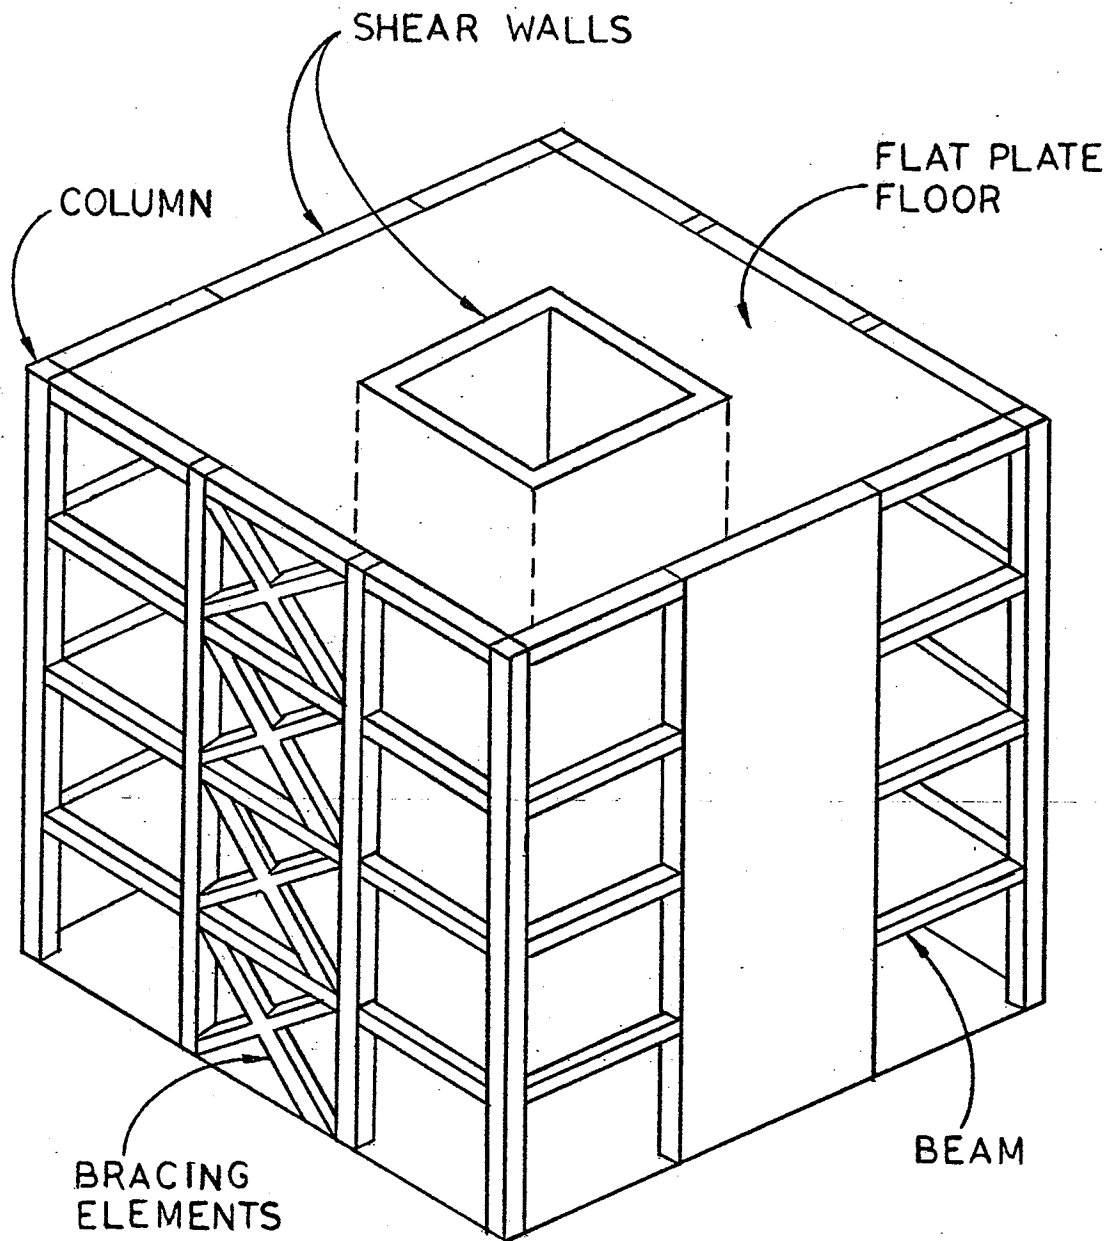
TYPICAL STRUCTURAL FRAMING SYSTEM FOR MULTISTOREY BUILDING
